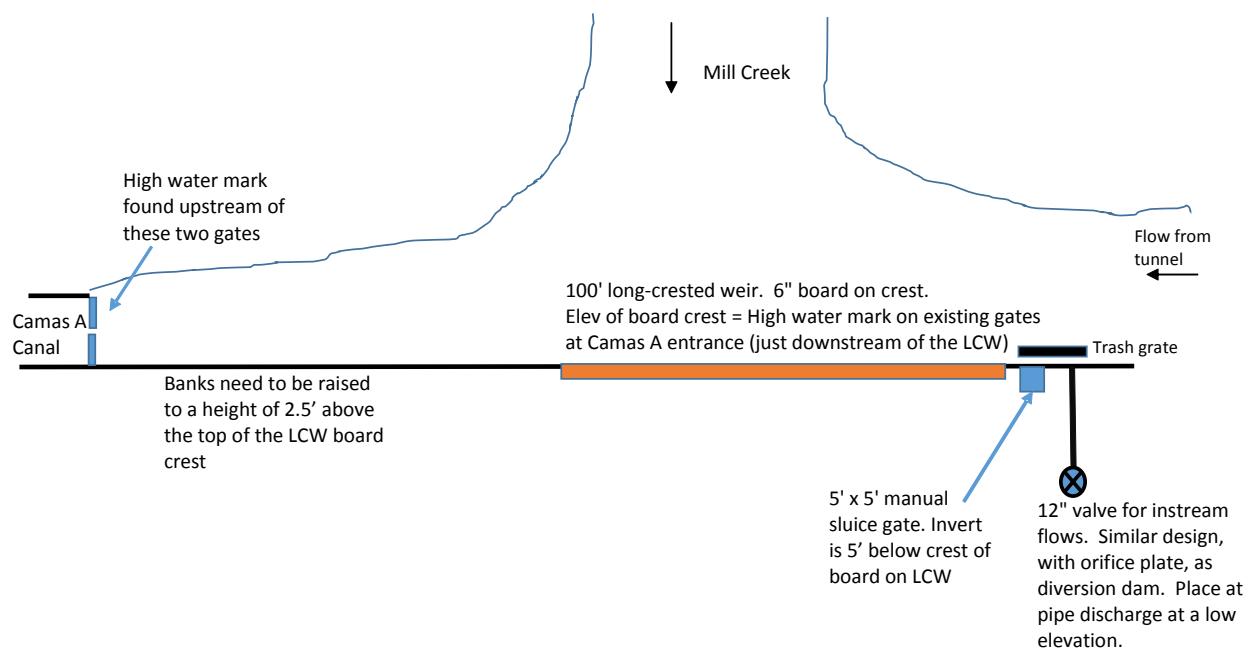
Conceptual plan view of long-crested weir layout (not to scale)
